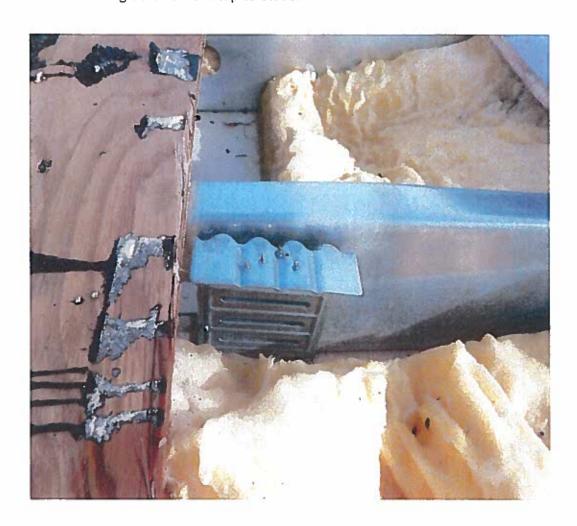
Example of improper installation, and not enough fastener penetration into steel causing connection failure.
